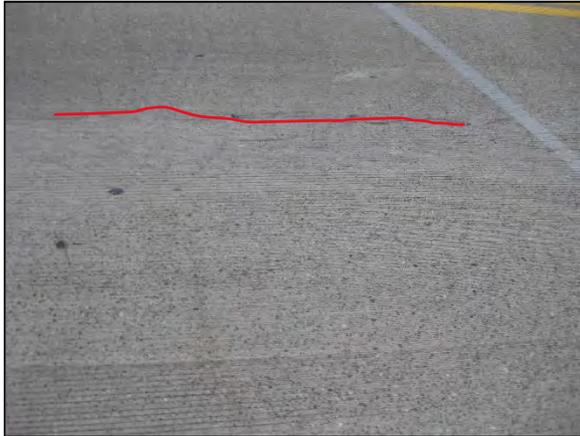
Longitudinal Crack – Perpendicular to UHPC
